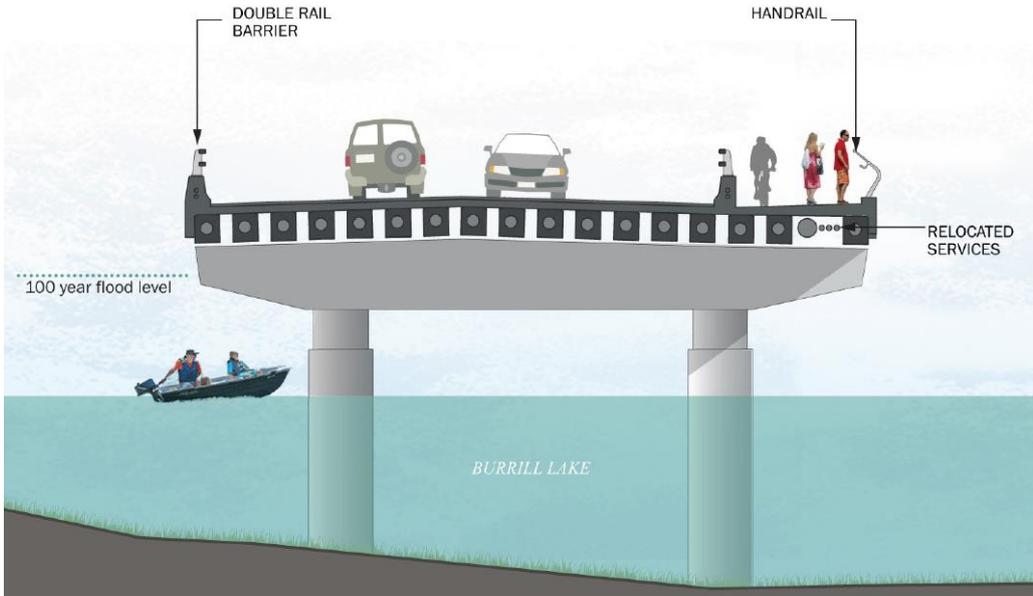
Bridge cross section (Jackson Teece 2013).
